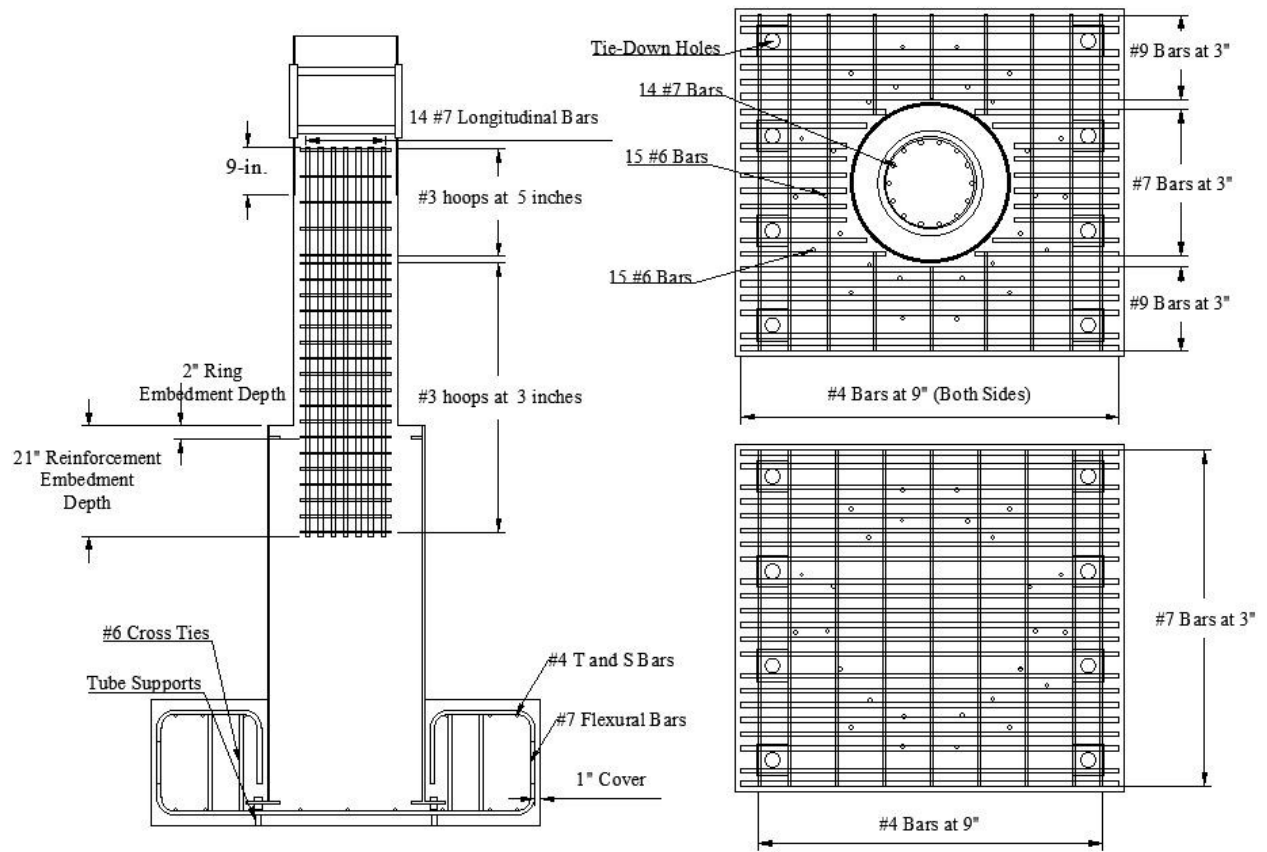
Specimen 30-21-R Reinforcement Layout
